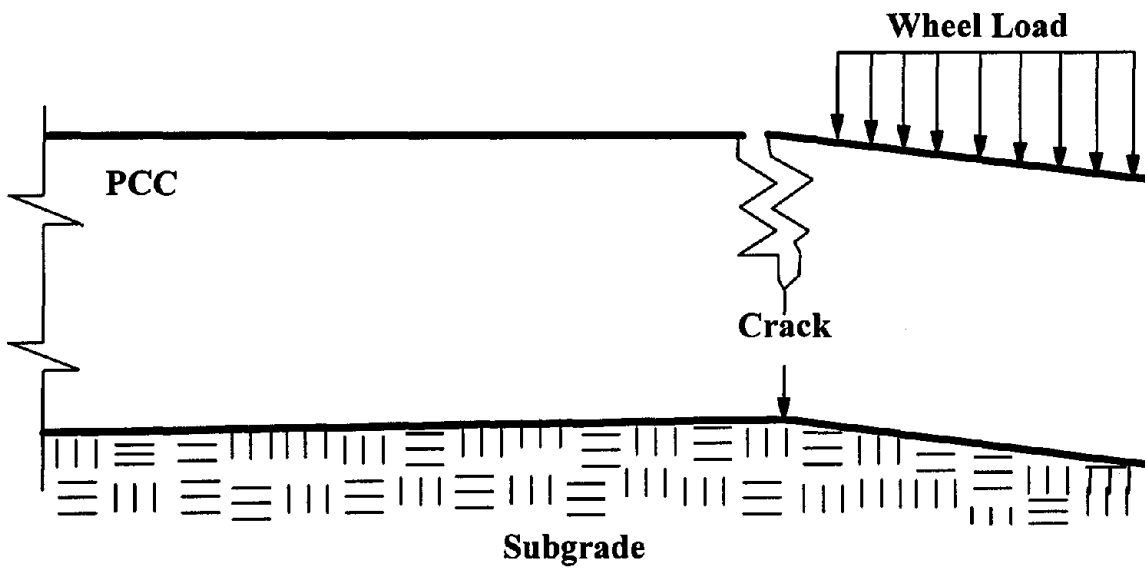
Pavement deformation with wheel load placed at the corner of the slab.
